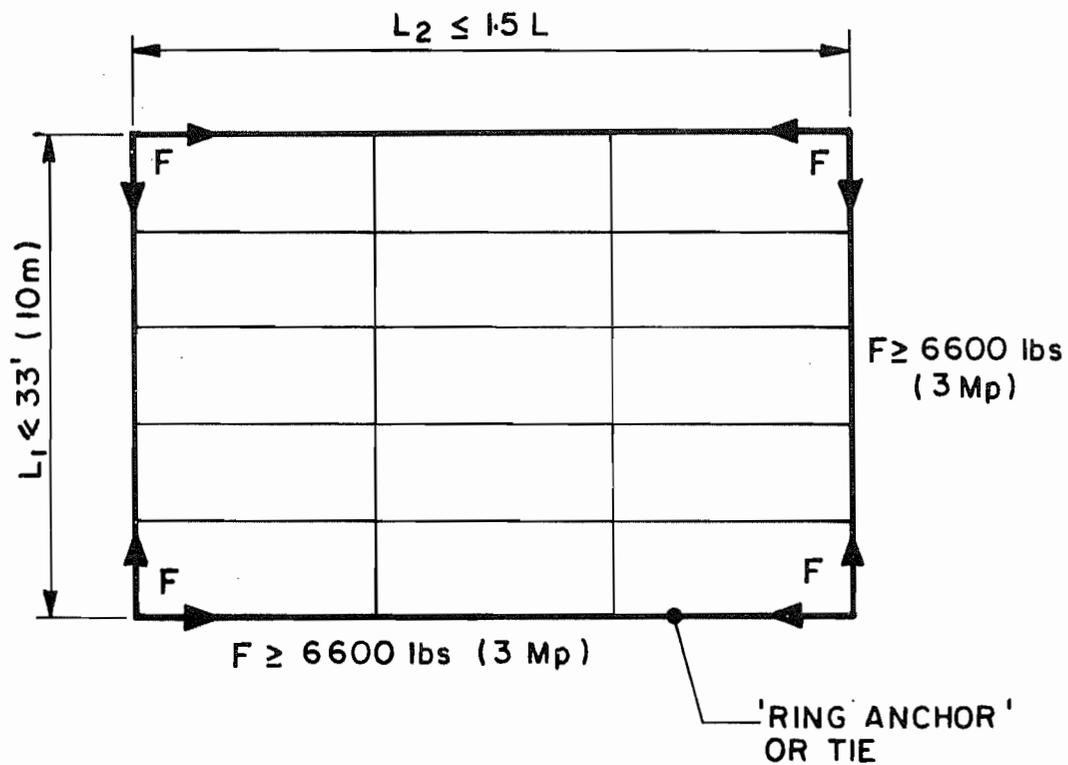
PROVISIONS TO ENSURE DIAPHRAGM ACTION IN PANELIZED FLOOR SYSTEMS [5.4]
